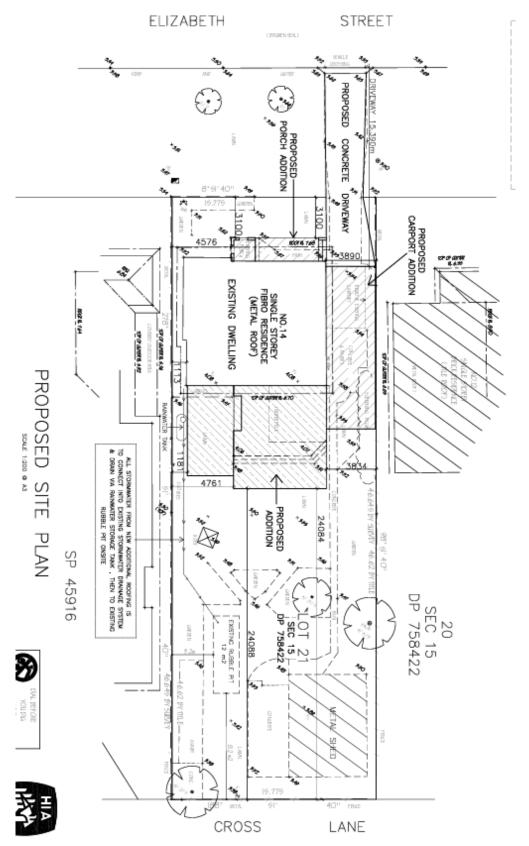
Site Plan Extract (Cinz & JB 3D, 2025).
